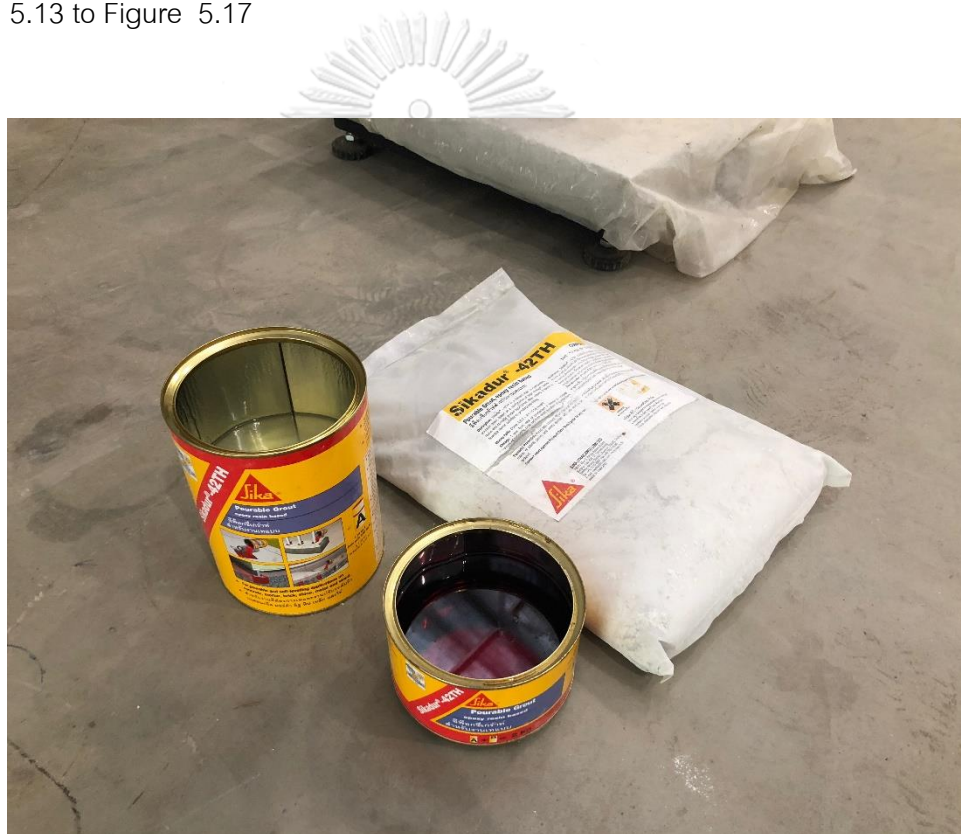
Epoxy use to fill the gap between collars and column edge
